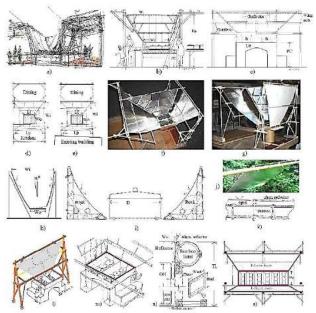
TRW Bamboo Cooker-Kitchen Studies: a) perspective sketch; b) south-north section; c) west-east section at TR; d-e) plan options; f-g) sketch model photos; h) nonimaging trough diagram for equatorial 8-12° latitude locations; i) wood/bamboo supporting funnel reflectors; j-k) aluminum facets bolted to bamboo; l) demountable horizontal bamboo poles with reflector facets temporarily supported on a bamboo frame; m) isometric of target rectangle with two linear funnels; n) detail of bamboo lintel supporting cookware door; o) plan with multiple linear funnels and multiple cookpots.
